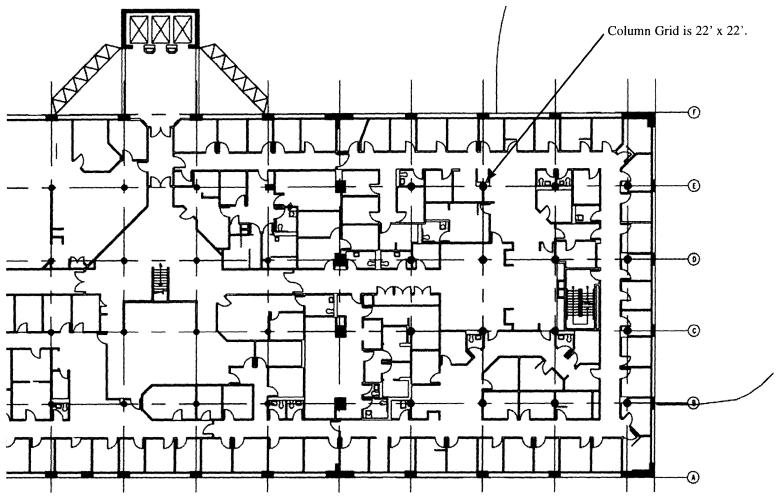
Fourth Floor Detail Plan: The Department of Internal Medicine. This image illustrates the existing column condition within this poured concrete structure. The bays are 22'x 22' on center. The columns are approximately 24" in diameter and the floor to floor height is 11' - 6". The difficulty of getting natural light into the space exists given floor plate's size of 110'x 470'. Needless to say, the physical constraints that this floor plate presents are challenging.
